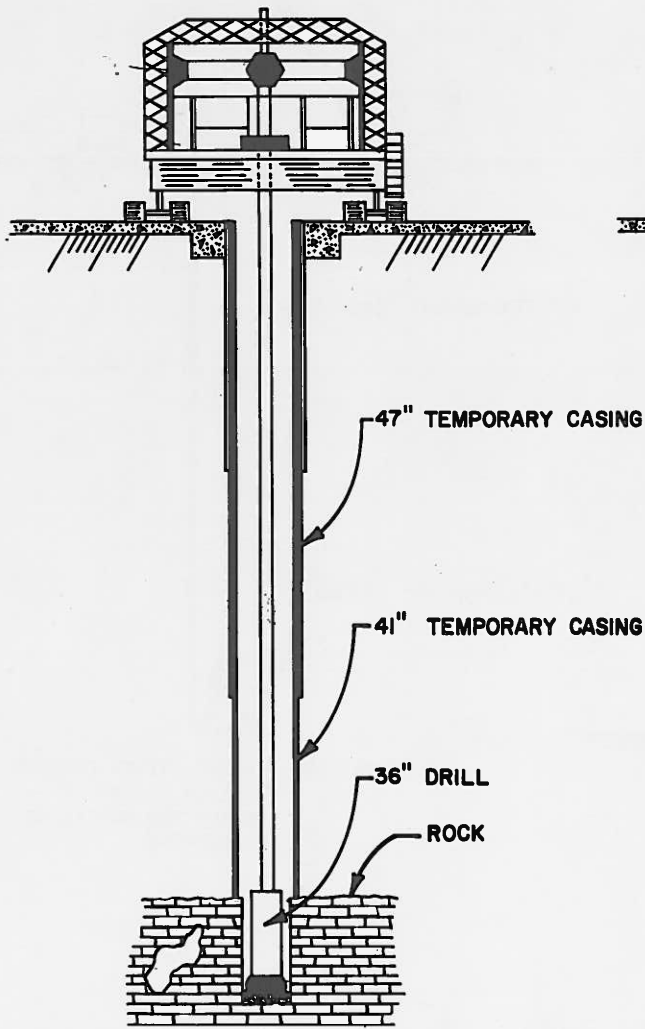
THE TEMPORARY CASING IS CARRIED TO BEDROCK AND THE ROCK DRILLED TO THE DESIGN ELEVATION.
